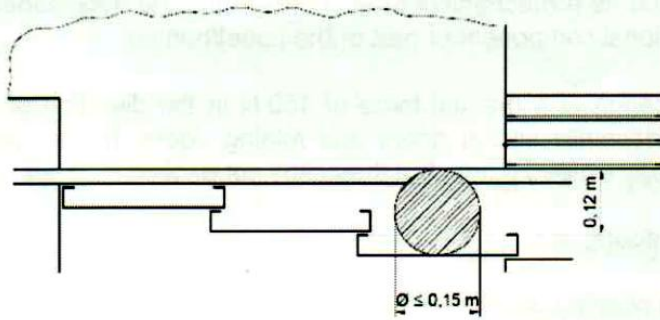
Horizontal sliding car and landing doors, not mechanically coupled
